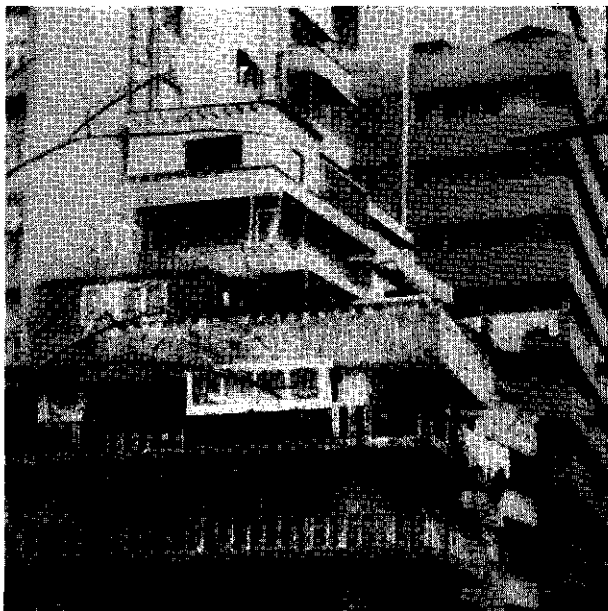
Wooden walls built around terrace to block views from outside and to extend dwelling unit. Cairo, Egypt [photo: Zuidema].
